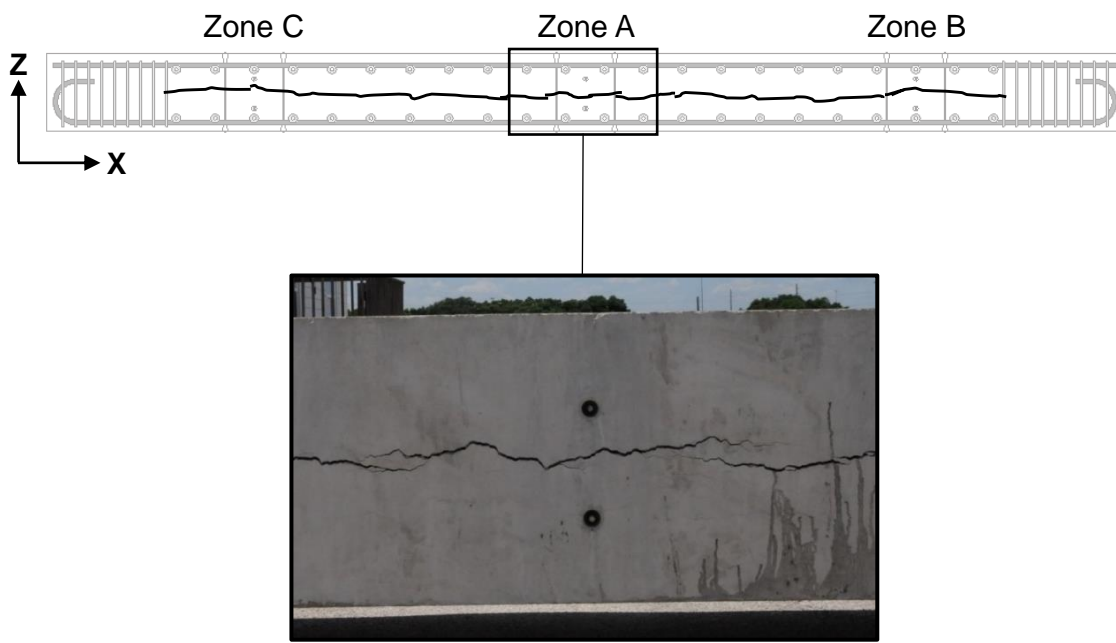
Mid-depth surface crack on X-Z specimen face
